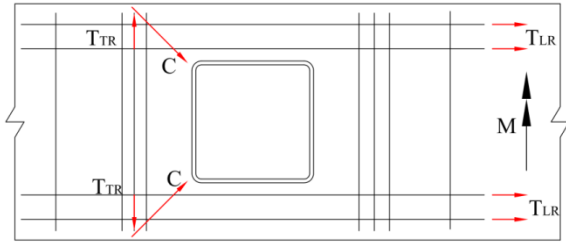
Strut-tie analogy of the concrete slab near the connection
